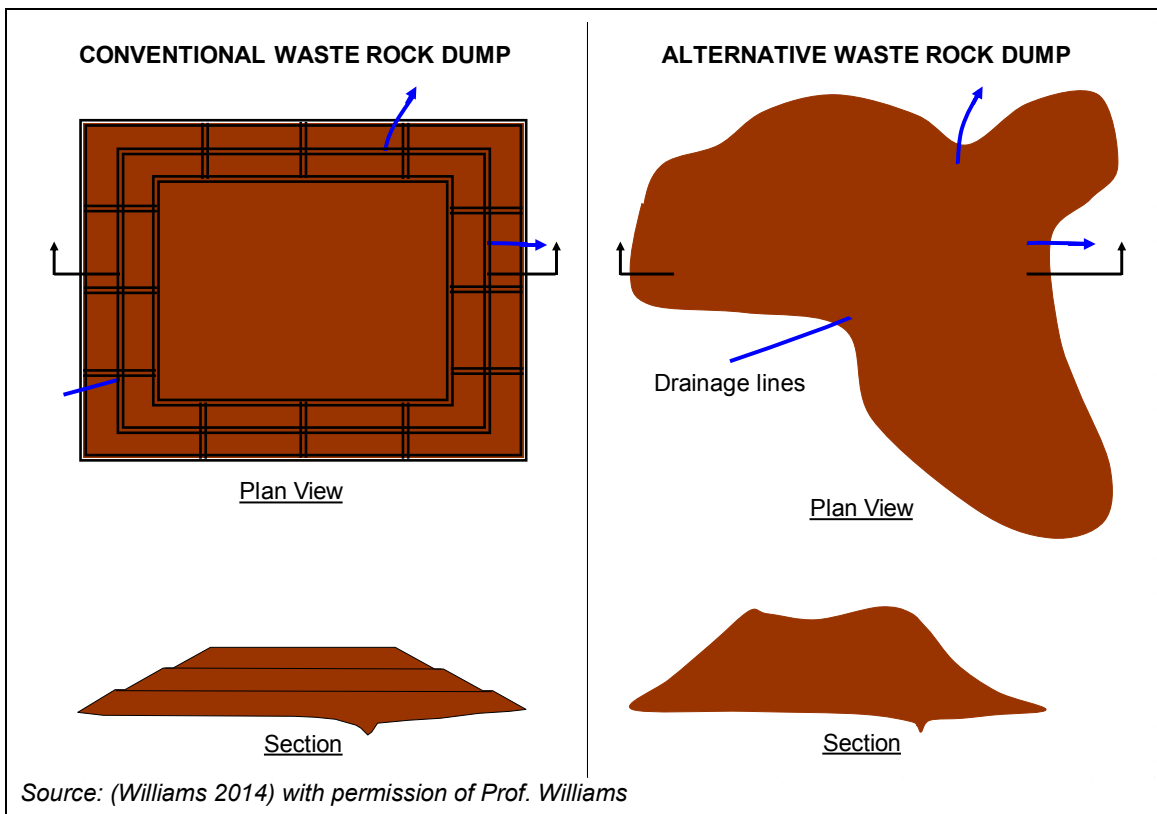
Scheme of a conventional layout and example of an alternative layout for waste-rock deposit rehabilitation
